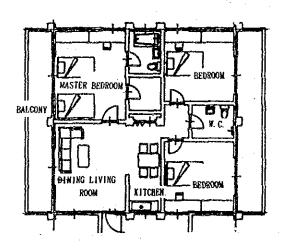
DWBLLING UNIT PLAN OF FACULTY QUARTERS
